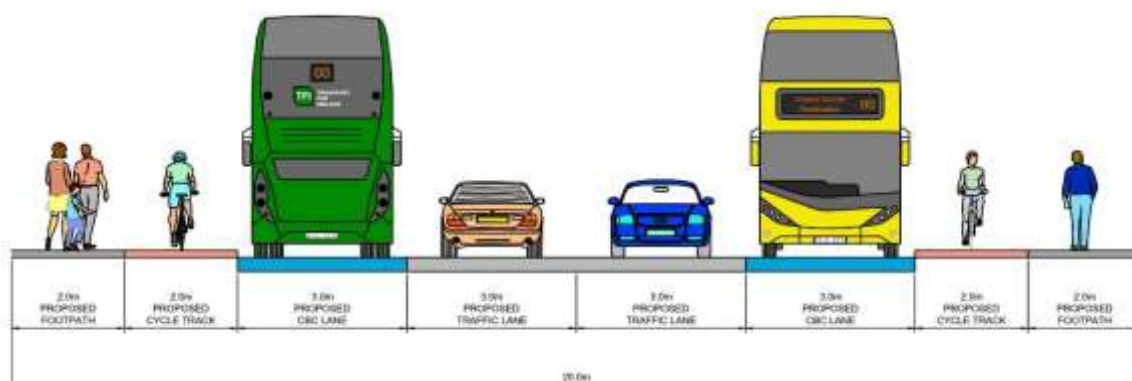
Typical Full Priority Cross Section (A – A & B - B)
